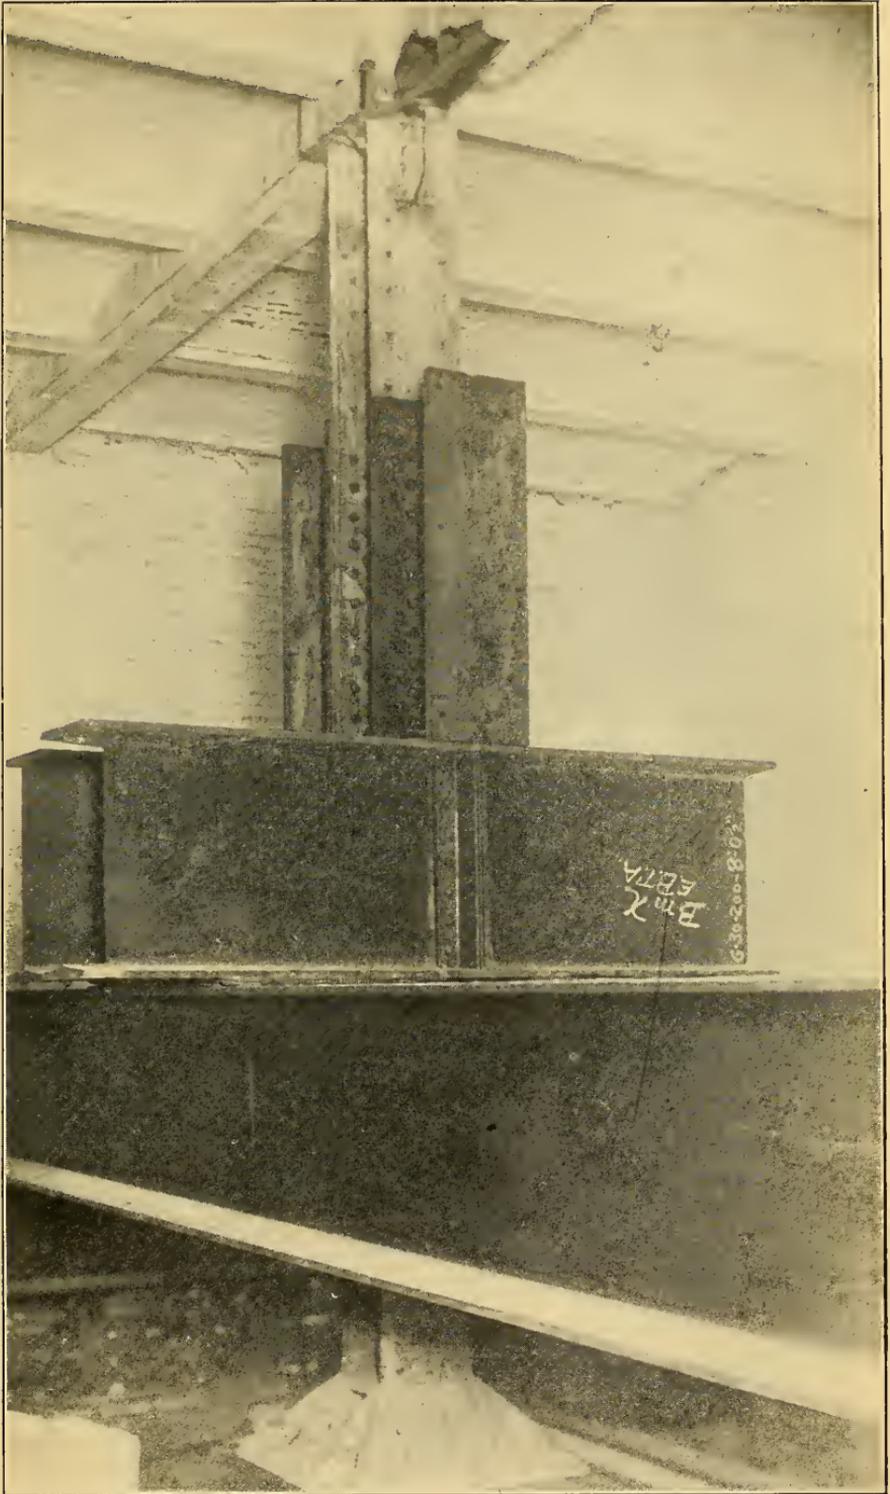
TEMPORARY SUPPORT OF 300 TON COLUMN IN BUILDING.
